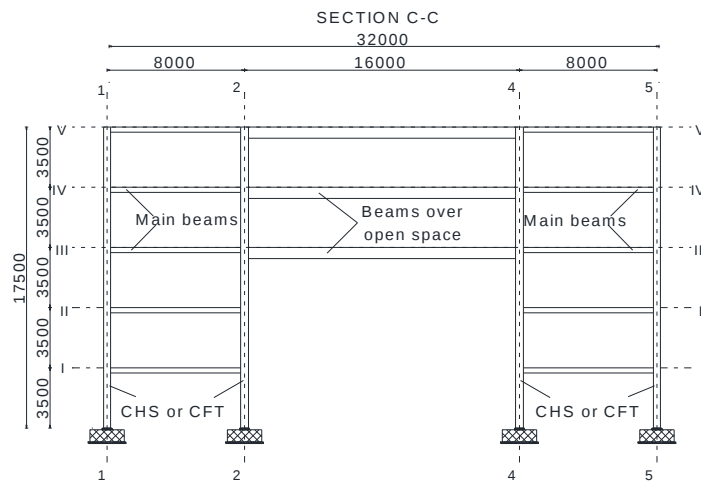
Sectional view for axis C-C of the 3D structue.
